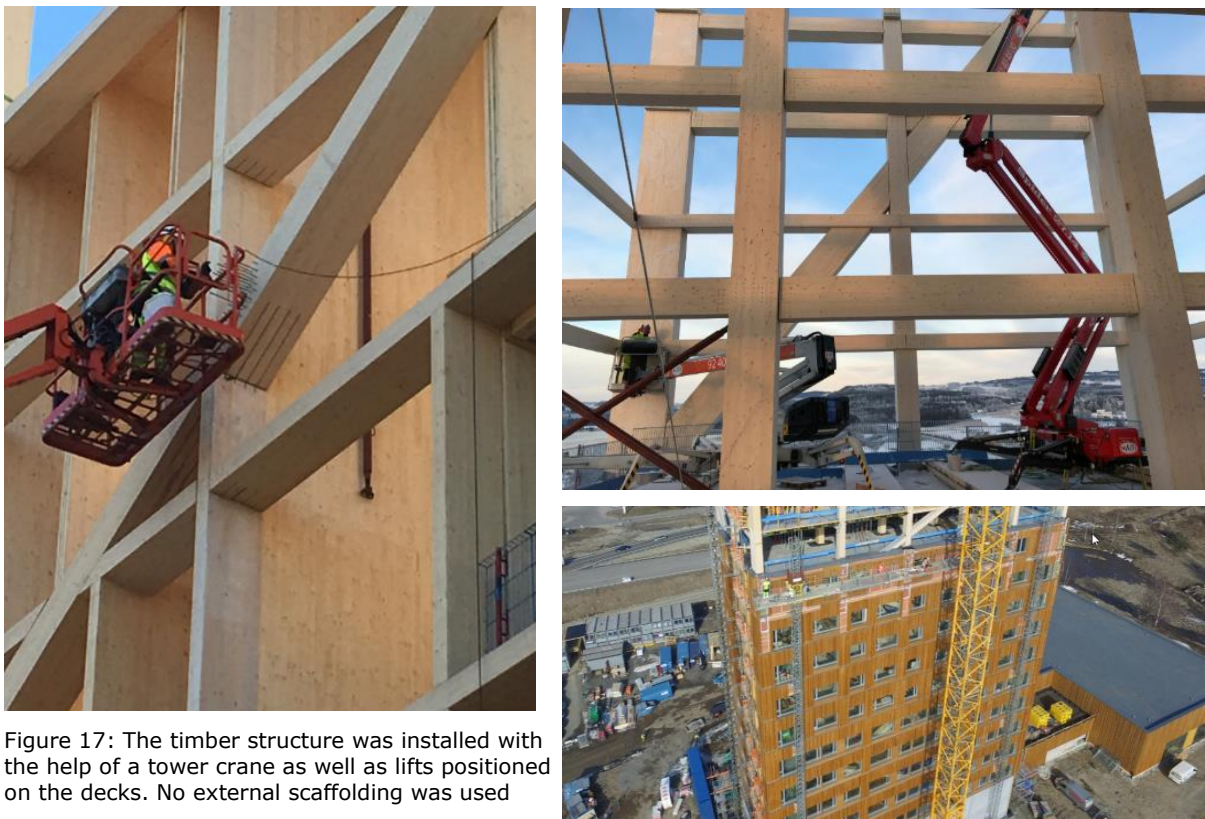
The timber structure was installed with the help of a tower crane as well as lifts positioned on the decks. No external scaffolding was used
